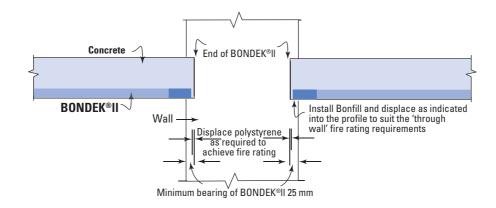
BONDEK® II fire detail at reinforced block walls
